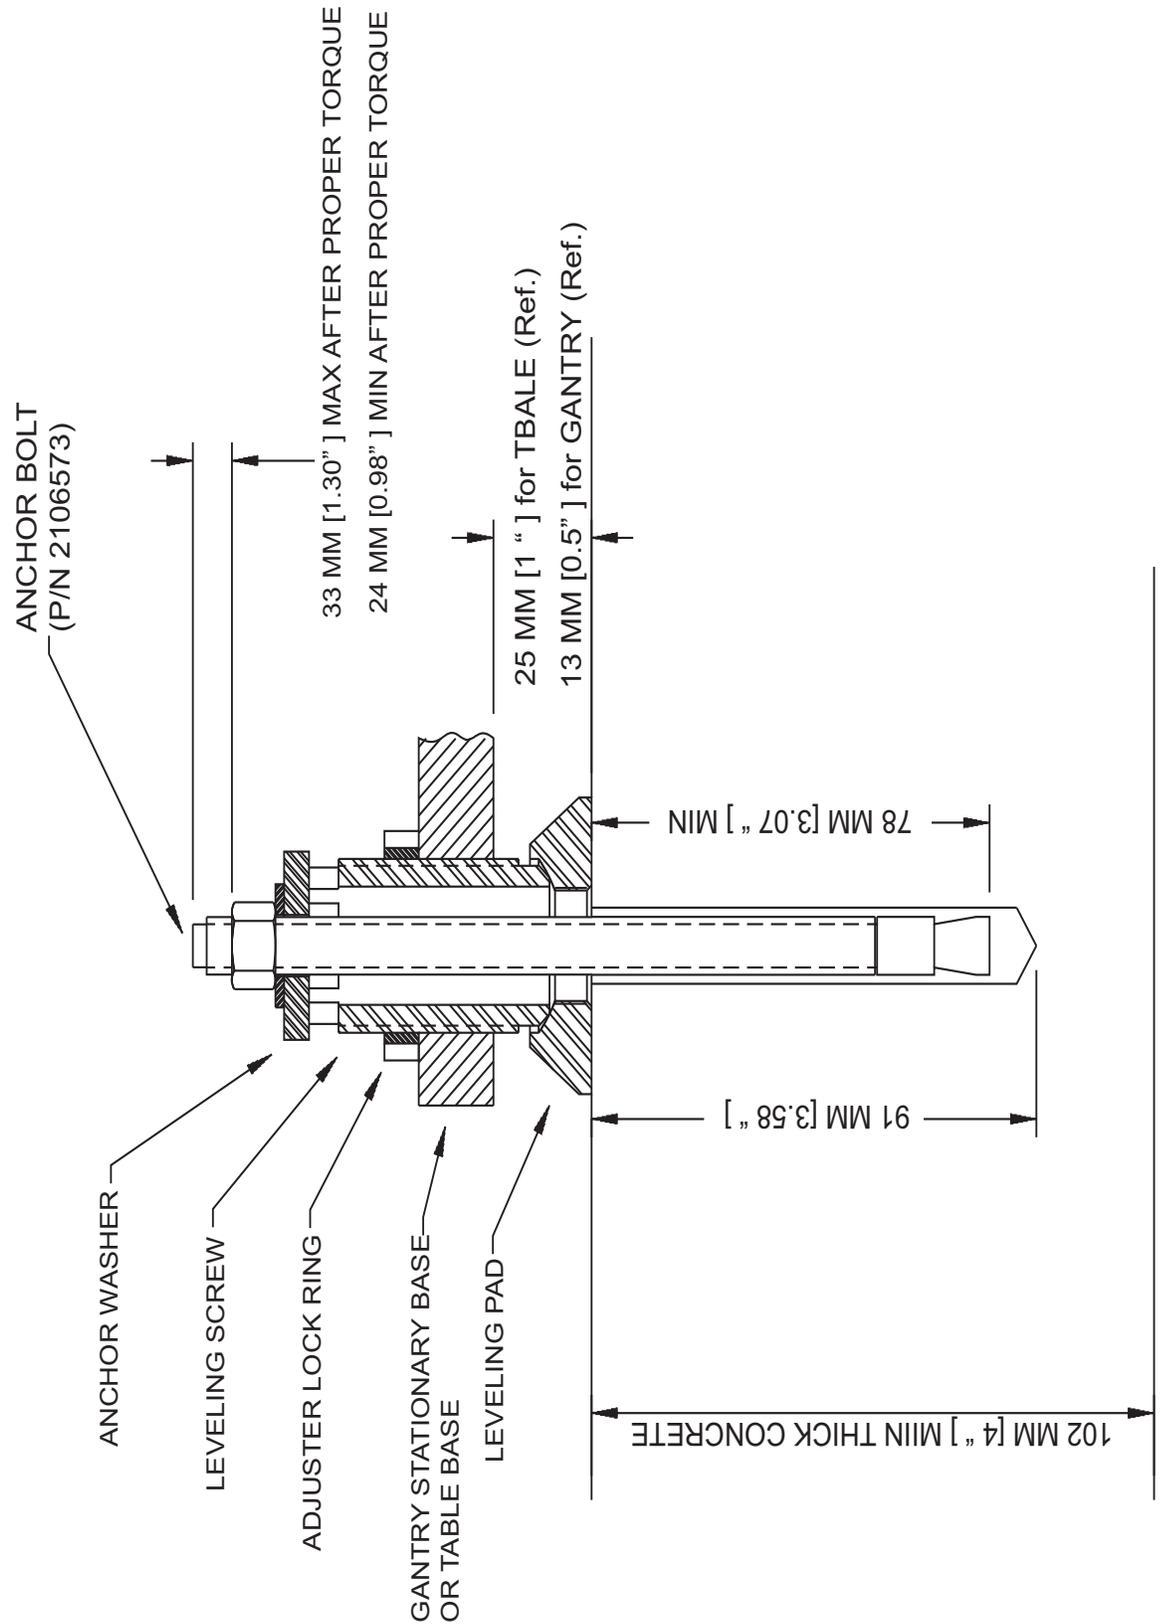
Gantry and Table Anchoring with 2106573 (8 in.) Anchor Bolt (GT 1700)
